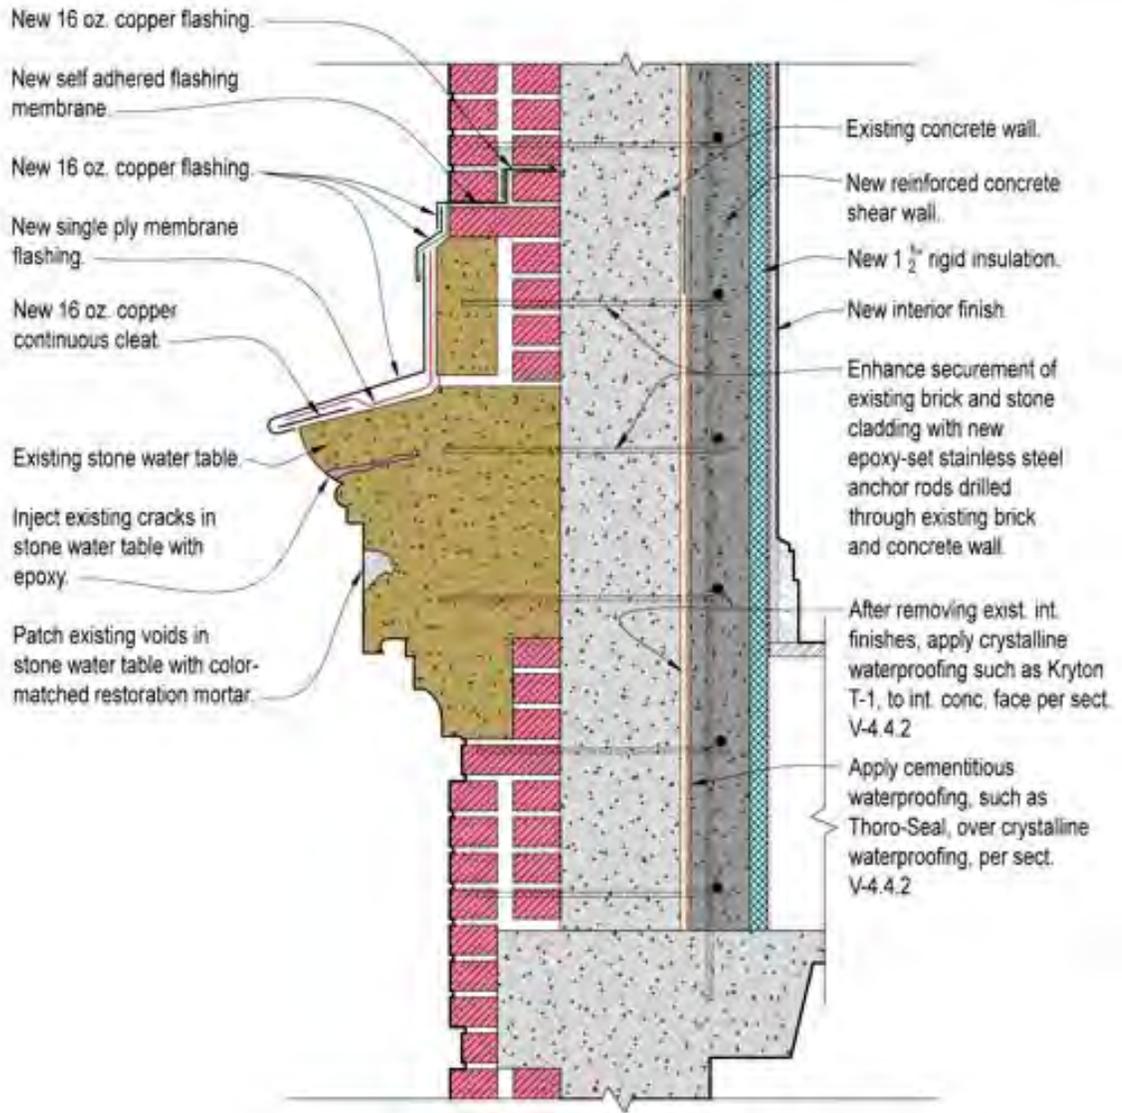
(1): Water Table Flashing, Anchorage, and Restoration Work
